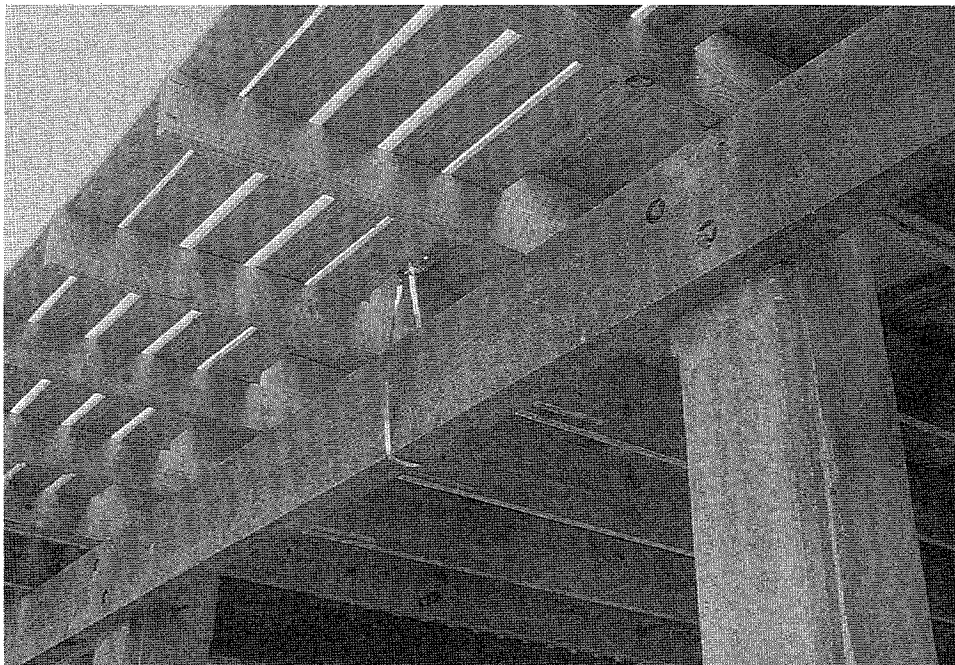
Steel bands were used to tie the now missing upper story walls to the foundation beams of the home shown in Figures 52 and 53.
